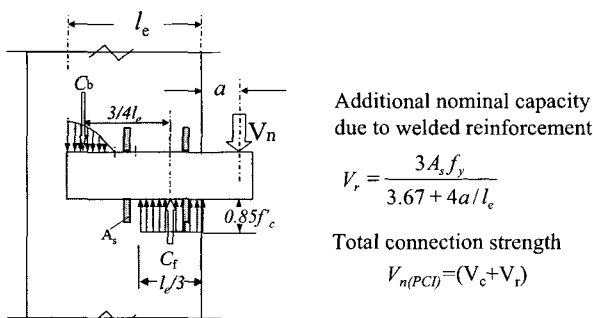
Concrete force system at ultimate load assumed by PCI committee
